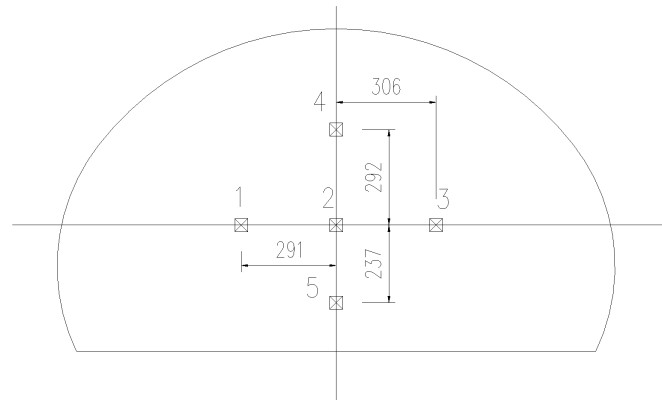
Layout of extrusion monitoring points at workface of tunnel (unit: cm)
